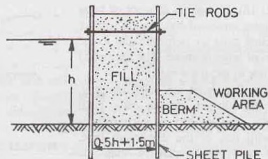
Double-Wall Sheet Piling Cofferdam.
